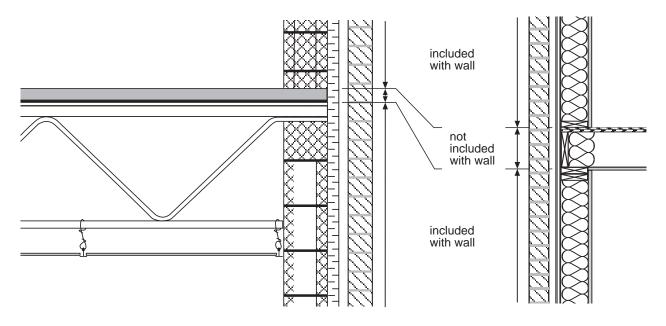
(1) Wall Area Discontinuous at Floor
